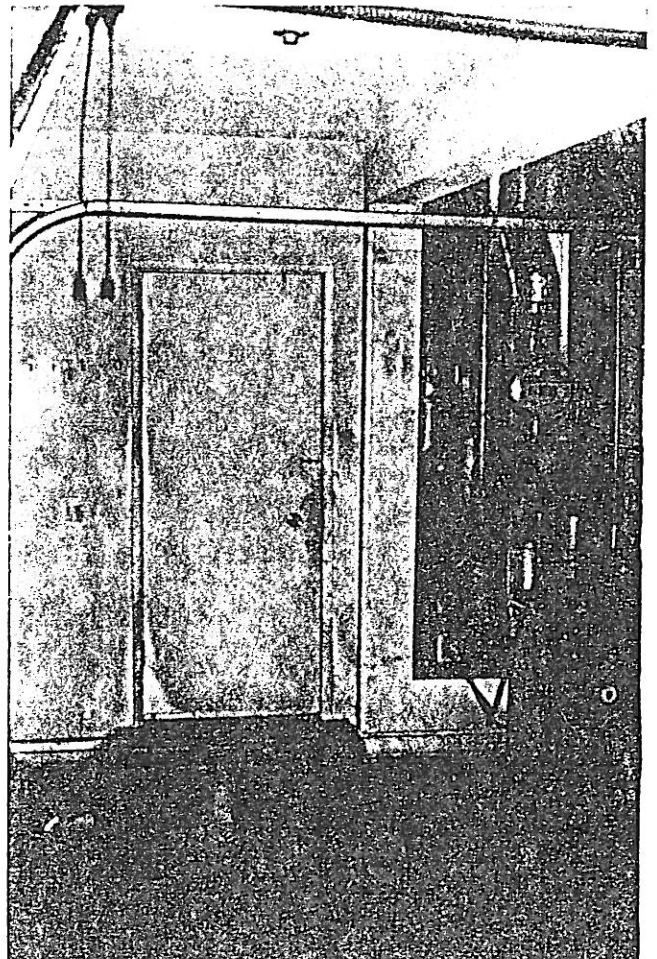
SHEETROCK ENCASED WOOD BEAM SUPPORTING FRONT END OF MAIN ROOF TRUSSES IN GARAGE SHOWS EXCESSIVE SAG.
